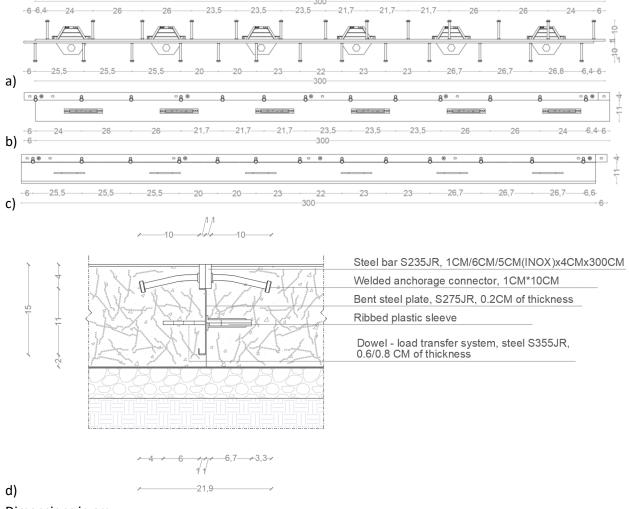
Detailed drawings of the StrongJoint Two Wave: a) Top view; b) Right side view; c) Left side view; d) Cross-section view
